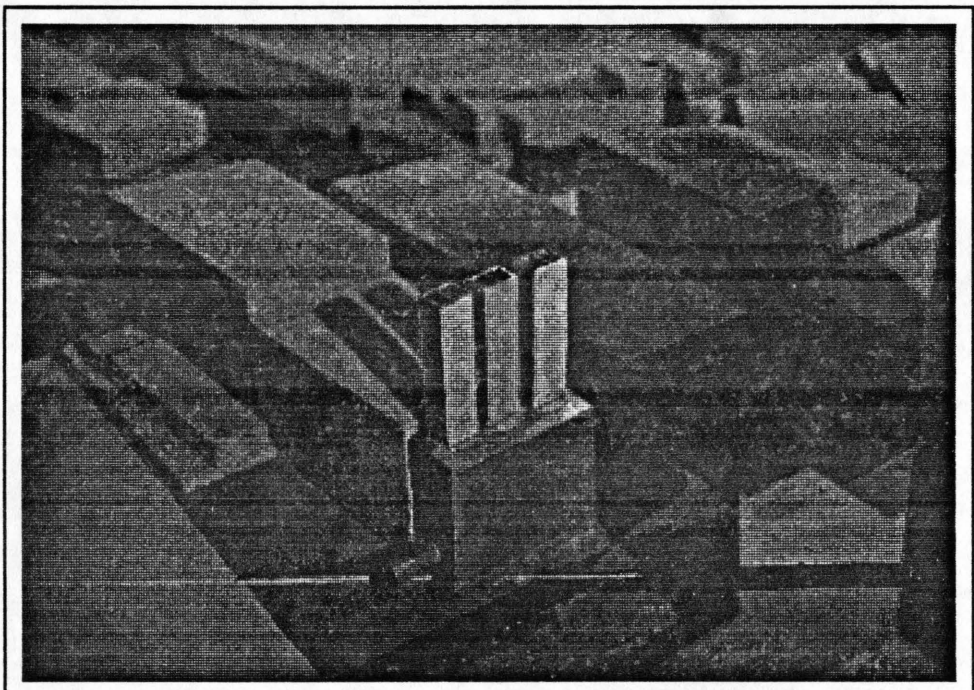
Charles river Vent Building Model : 100 foot building, 200 foot stacks
